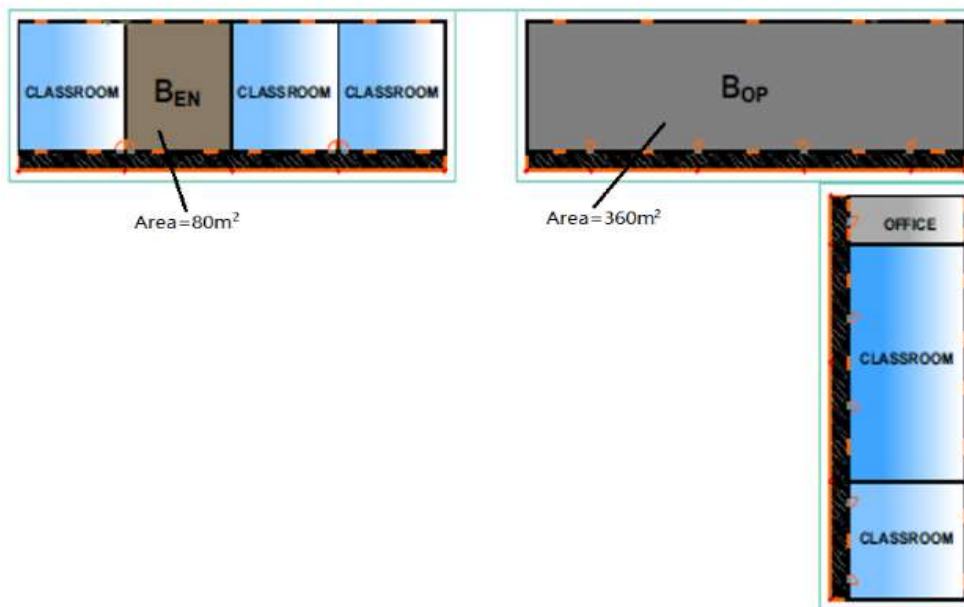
Floor plan of a sampled 'dwarf wall' classroom (denoted B_{OP}) and classroom with 'enclosed wall' classroom (denoted B_{EN})
